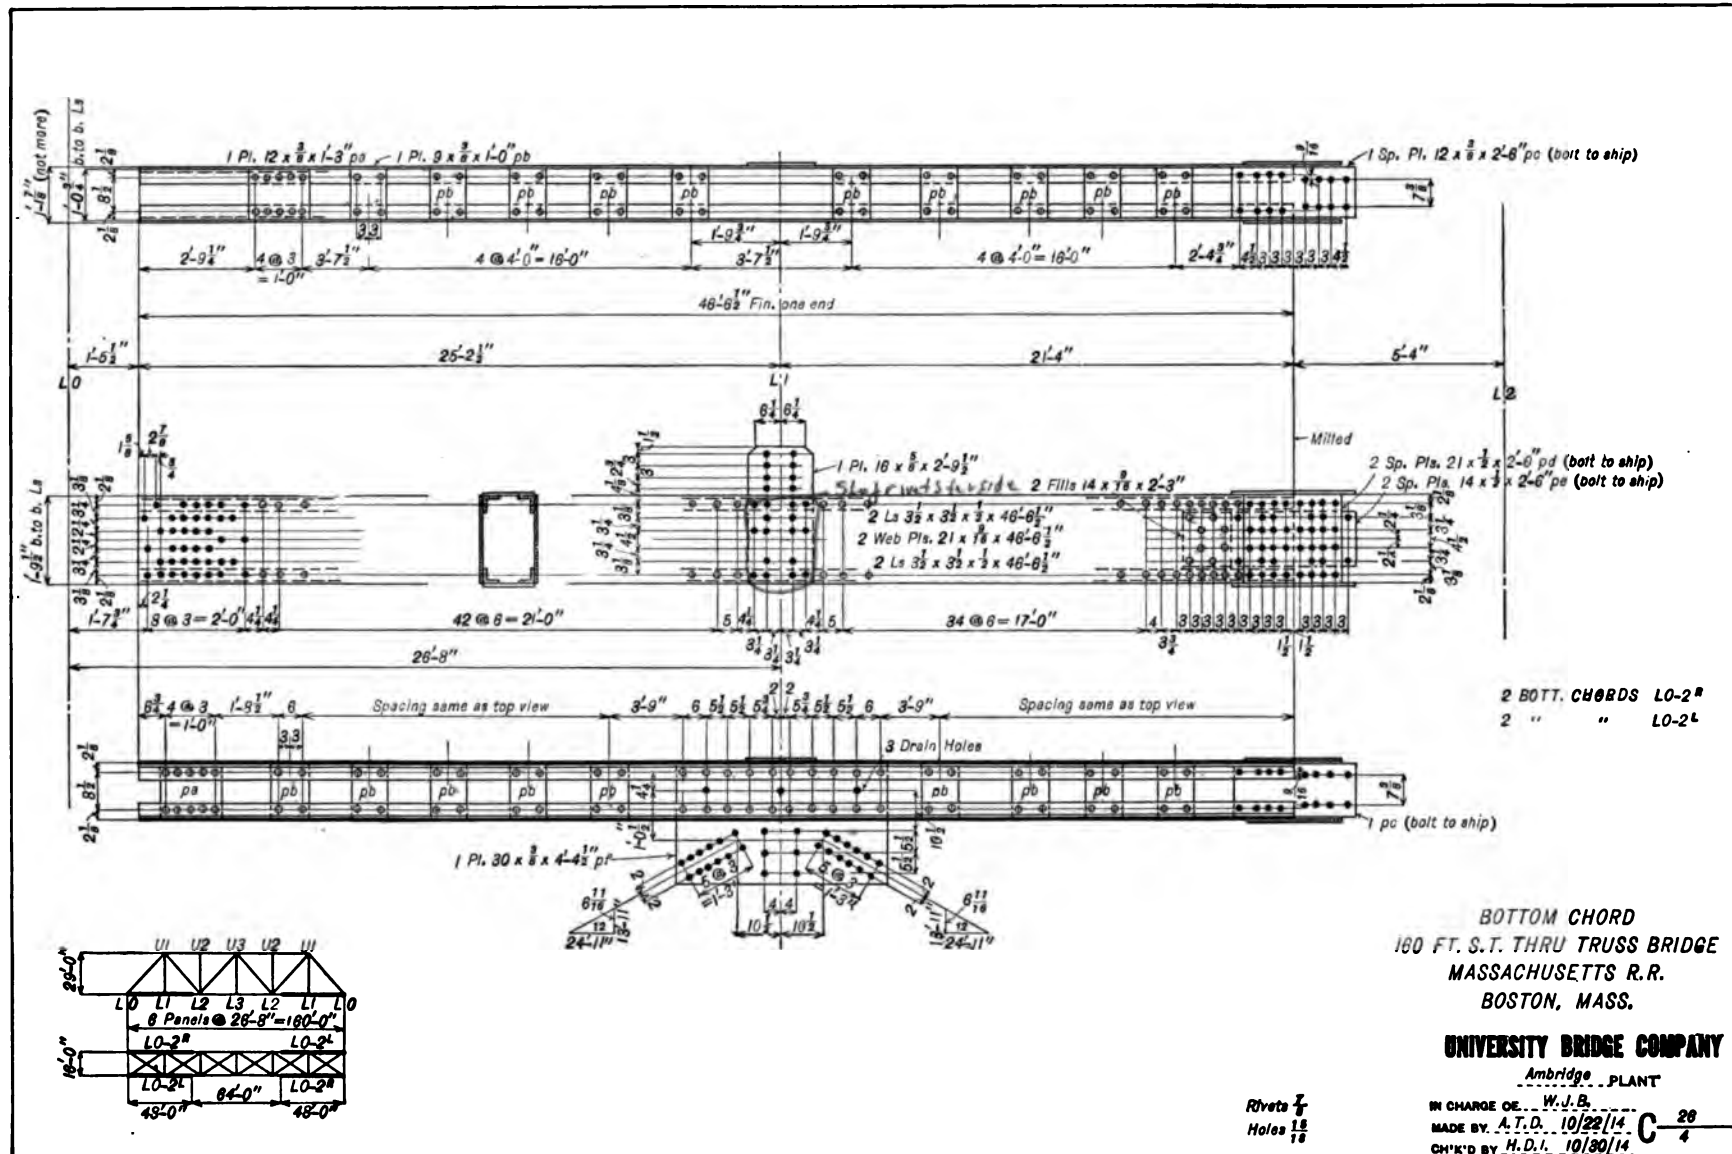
Bottom-chord Member for Riveted Truss of a Railroad Bridge.
